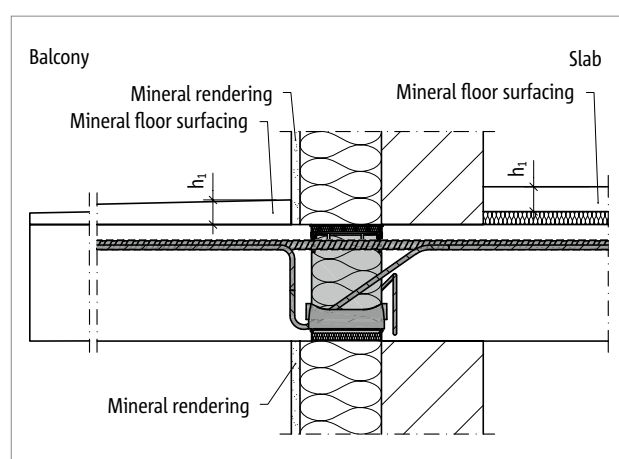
Schöck Isokorb® CXT type K-E-REI120: Flooring material for higher fire protection classes
